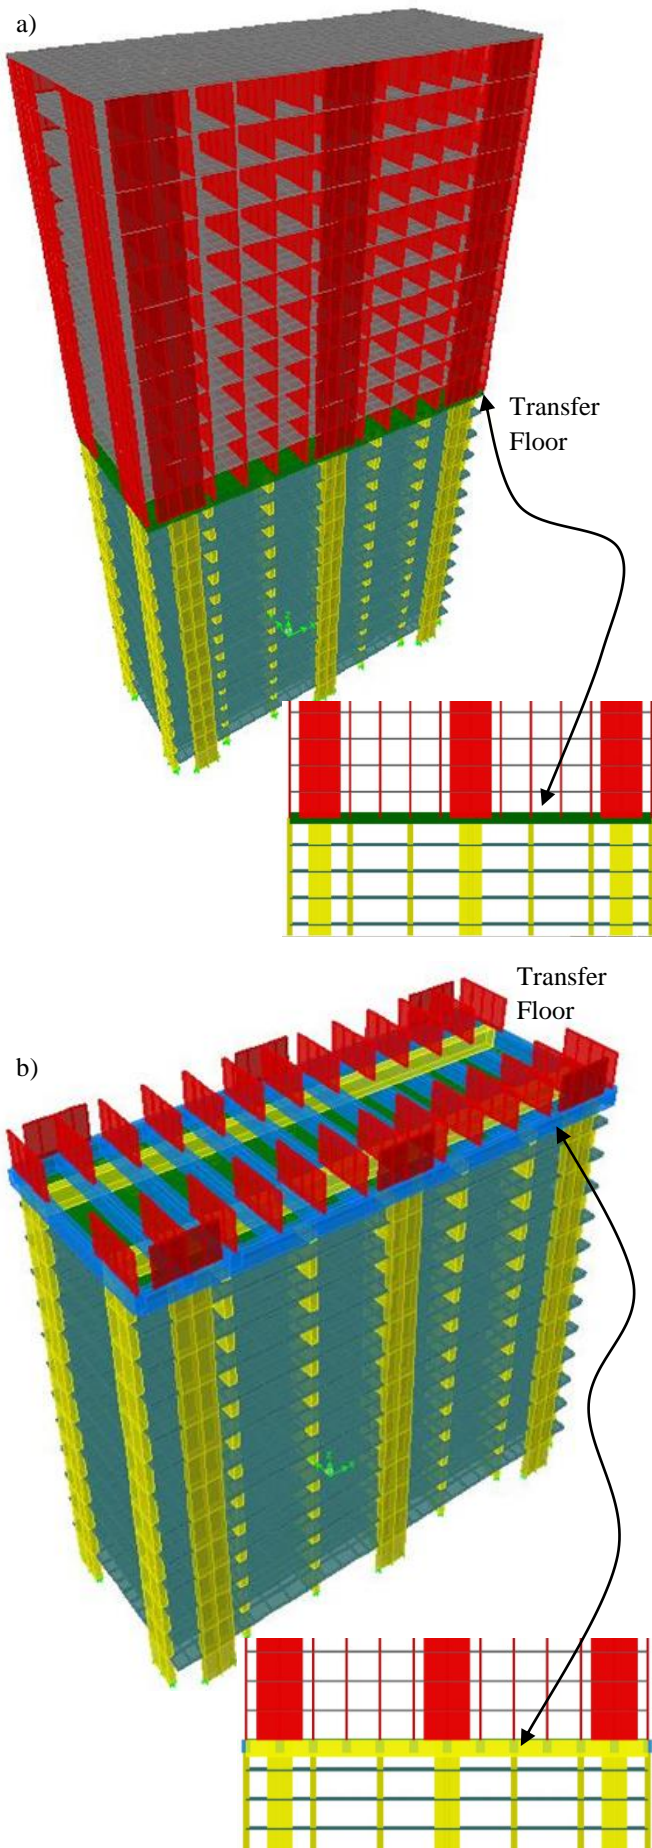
Finite element model for the 25 stories building model with transfer system at 50%H: a) transfer slab and b) transfer
